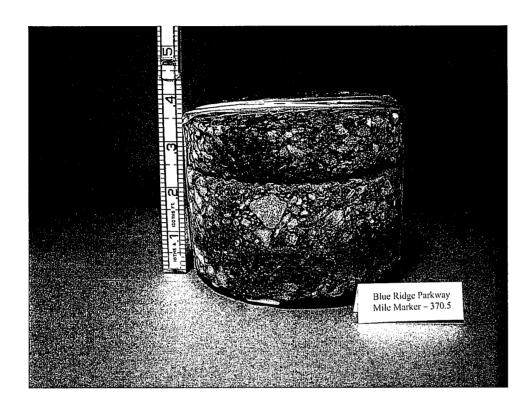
Additional Asphalt Cores Mile Marker 370.5
